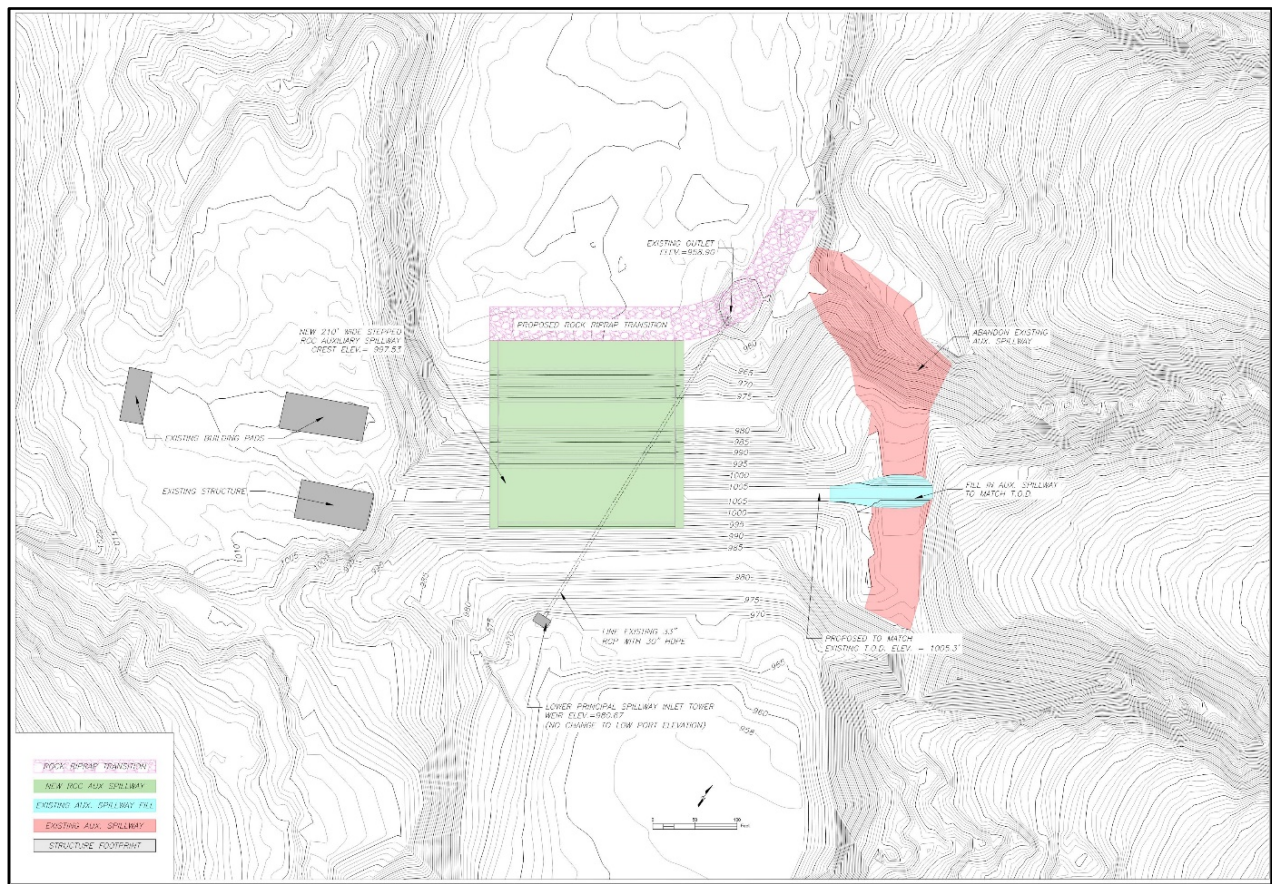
Plan view of new auxiliary spillway in Alternative 3.
